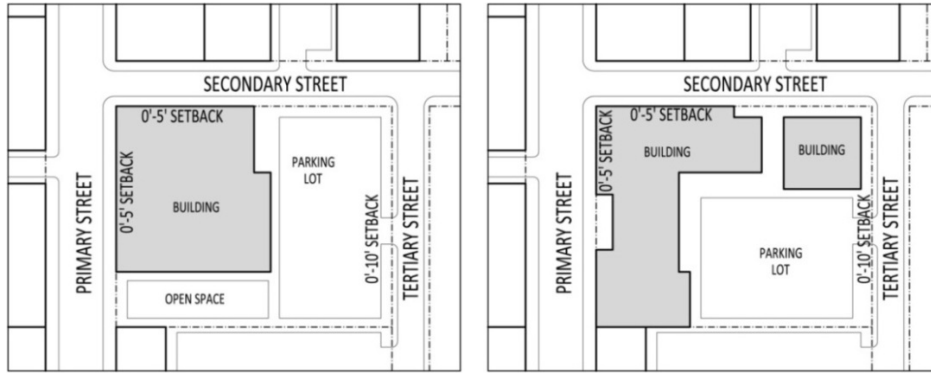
Setback Diagrams: Building[s] shall be located within 5' of lot line for 75% of Primary Street frontage and 50% of Secondary Street frontage.
